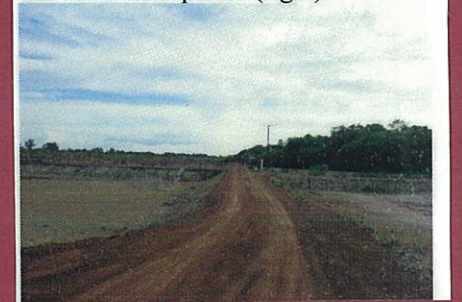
Nov 05. Dry road base on top of dike walls of Pond 1 (NW corner view where electrical cable will run to base camp).
